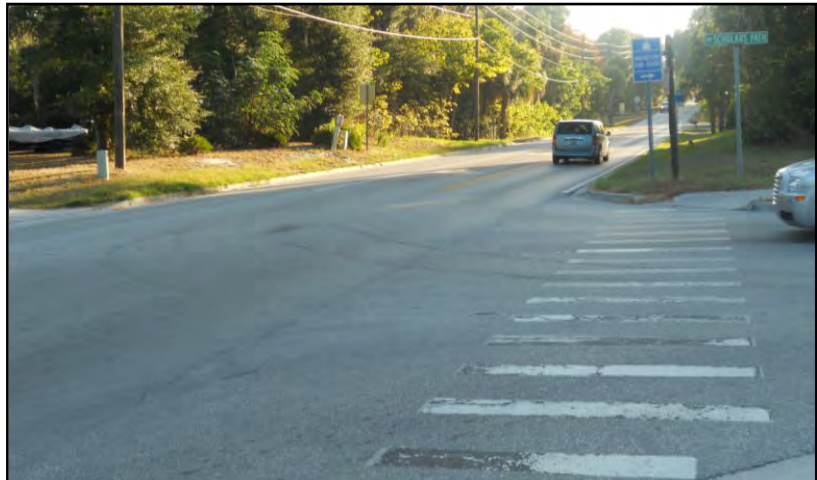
Worn out crosswalk and missing sidewalk on Blue Springs Avenue
